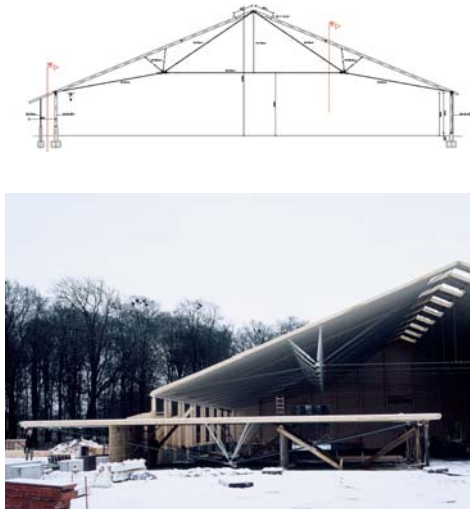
Technical cross-section and a roof element after assembly, before erection.
